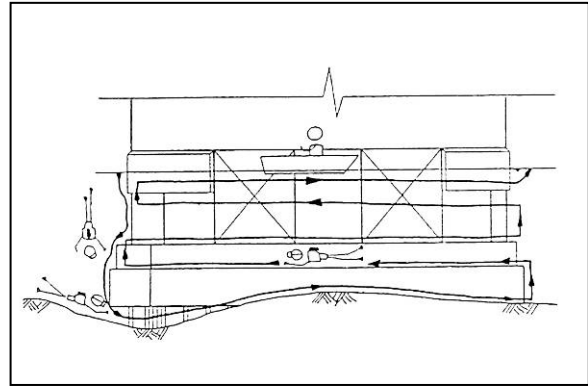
Schematic Representation of a Diver Inspecting a Pier
